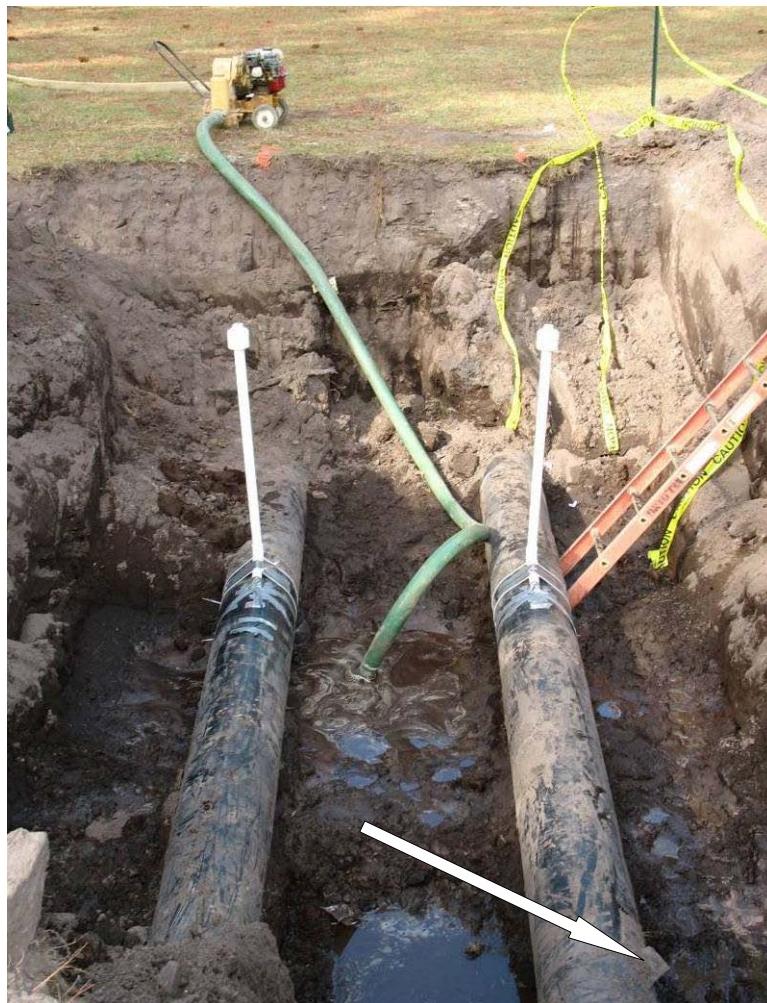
Site 1 excavation with installed instrumentation, facing north, showing damage to outer jacket occurring during excavation (see arrow).
